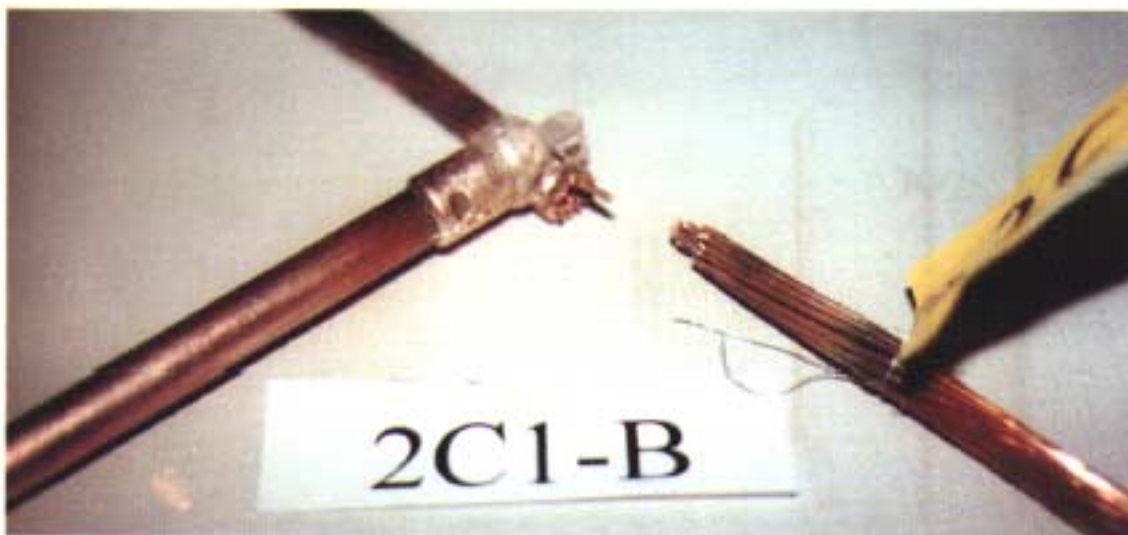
Typical Failure Modes for Cadweld Welded Connections
